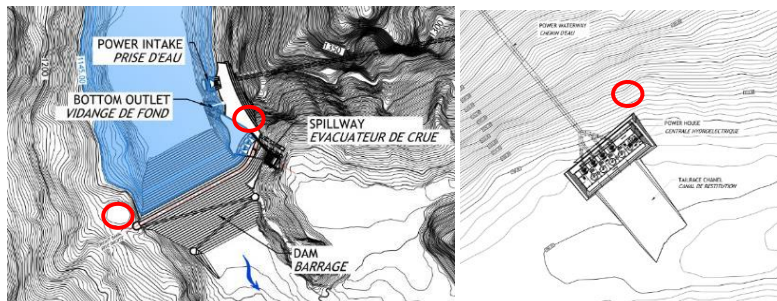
Provisional Meeting Points at Dam Site (left) and Powerhouse Site (right)
